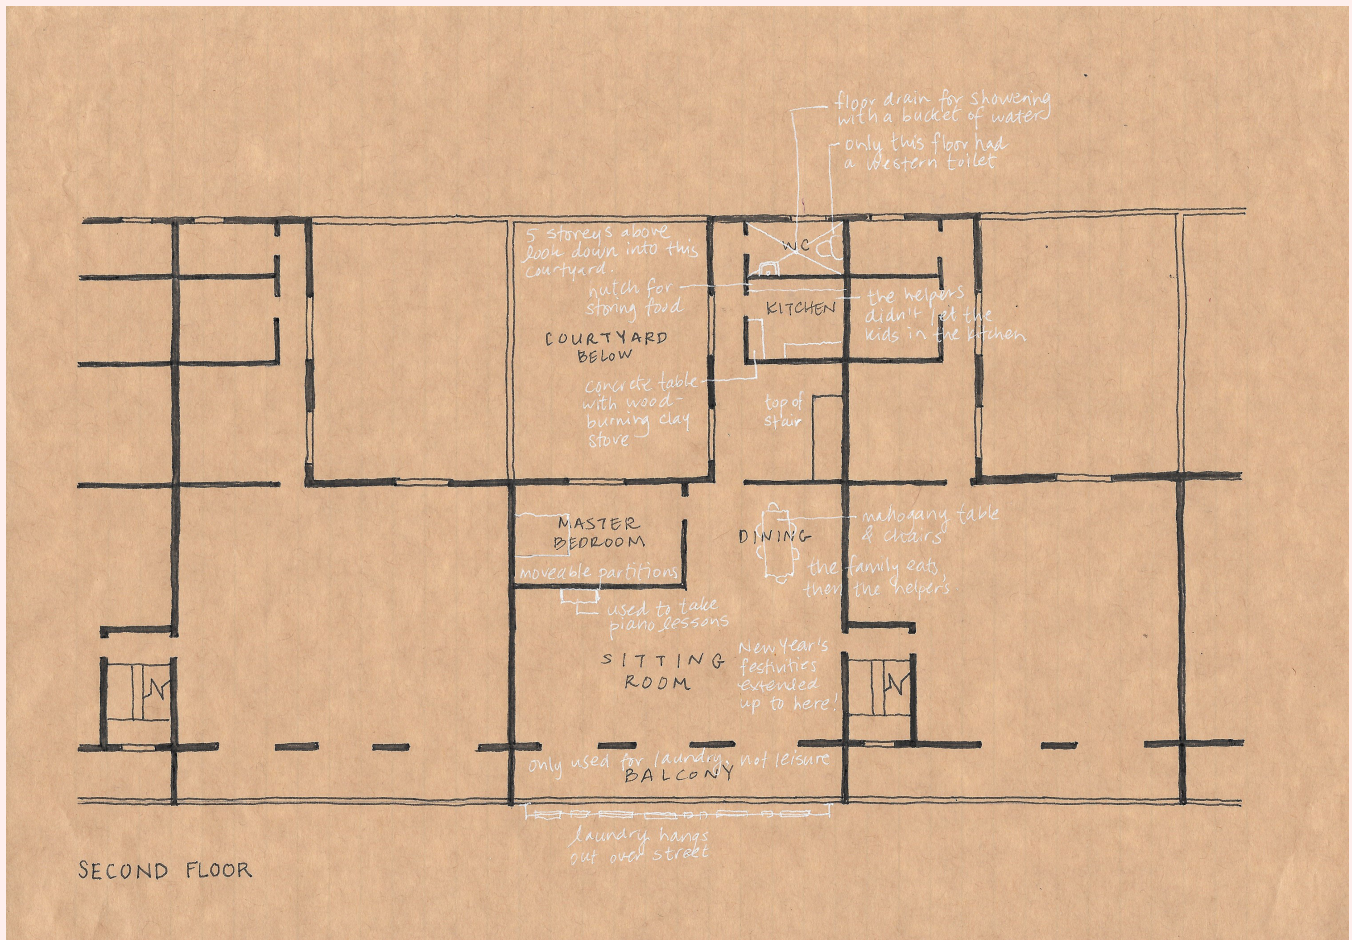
Home in Wan Chai second floor plan, image by author.
